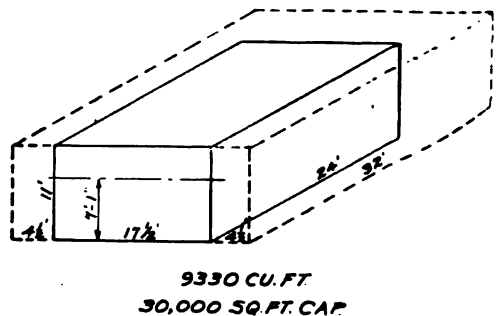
SPACE REQUIREMENTS FOR TWO STEEL BOILERS.
